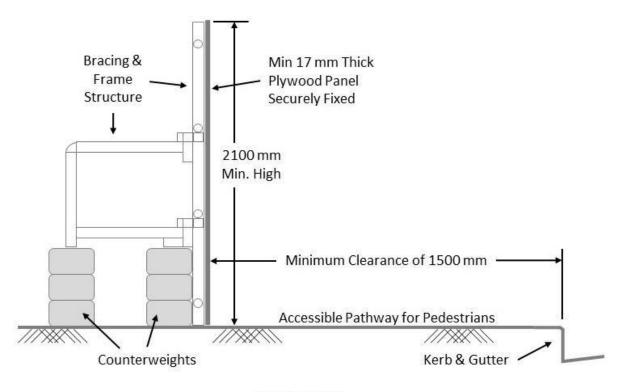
Typical Low Risk Type A Hoarding Section/Detail
